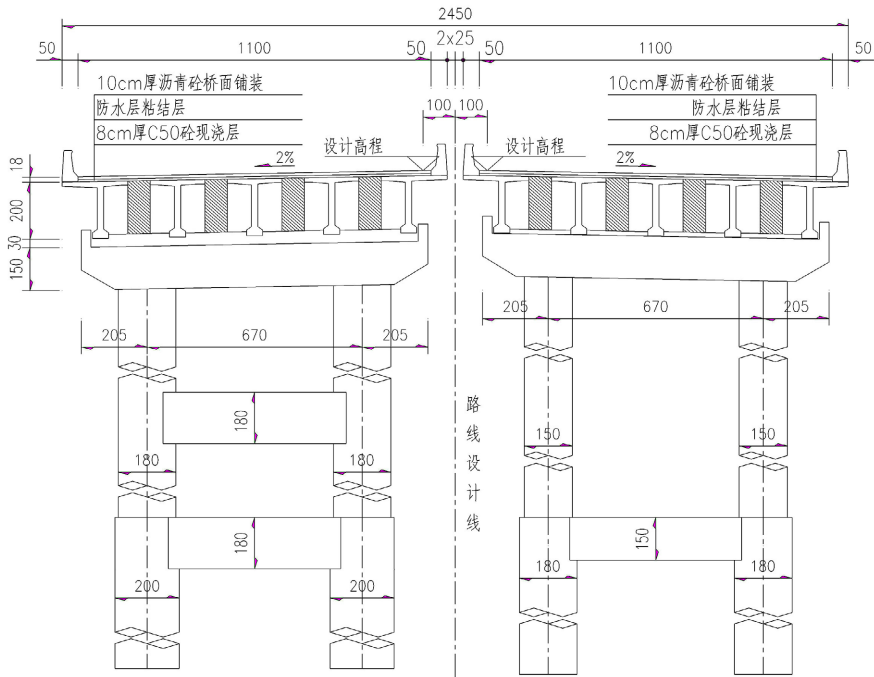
Cross-sectional diagram of the bridge (Unit: cm)
